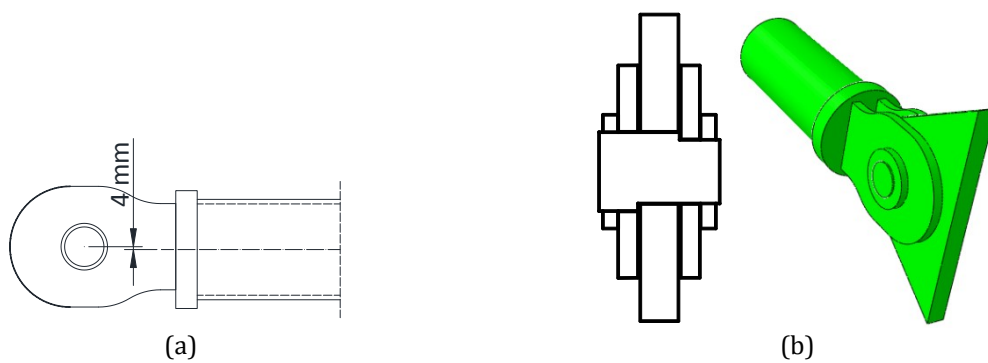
Connection eccentricity (a) and improved connection detailing (b).
